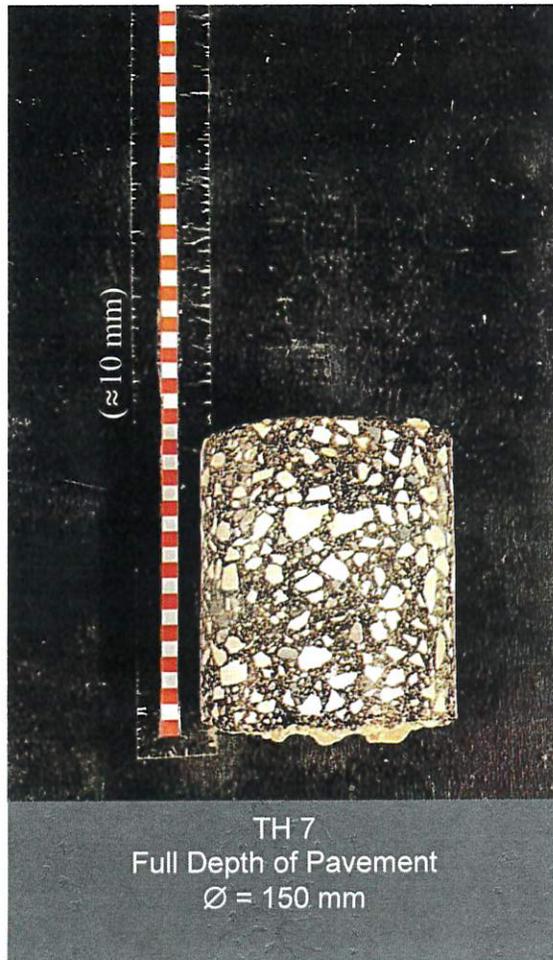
Specimen from Plessis Road, Northbound Lane
